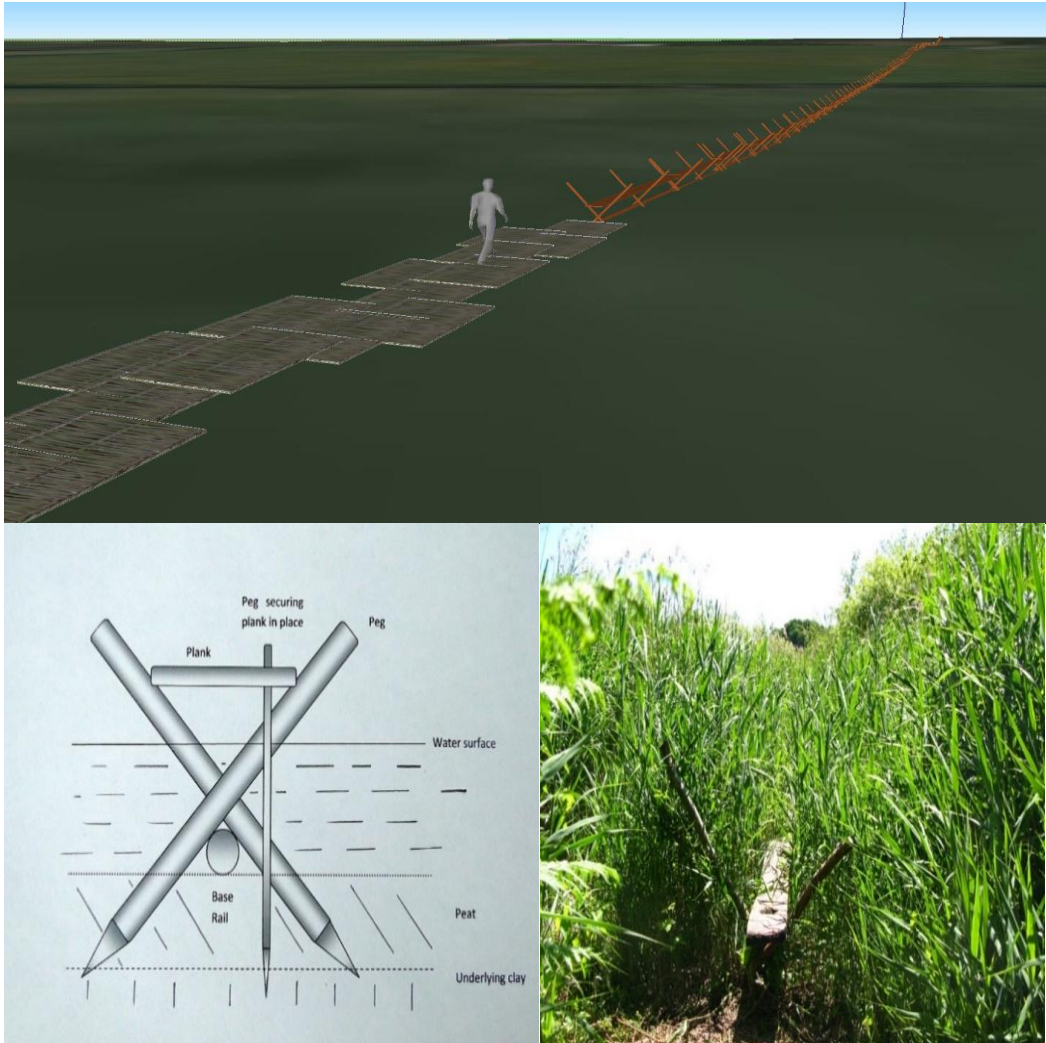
Top - Digital reconstruction of Sweet Track, southern end, where it joined Post Track, Bottom left – Cross section, Sweet Track, Bottom right - Replica of Sweet Track Above
